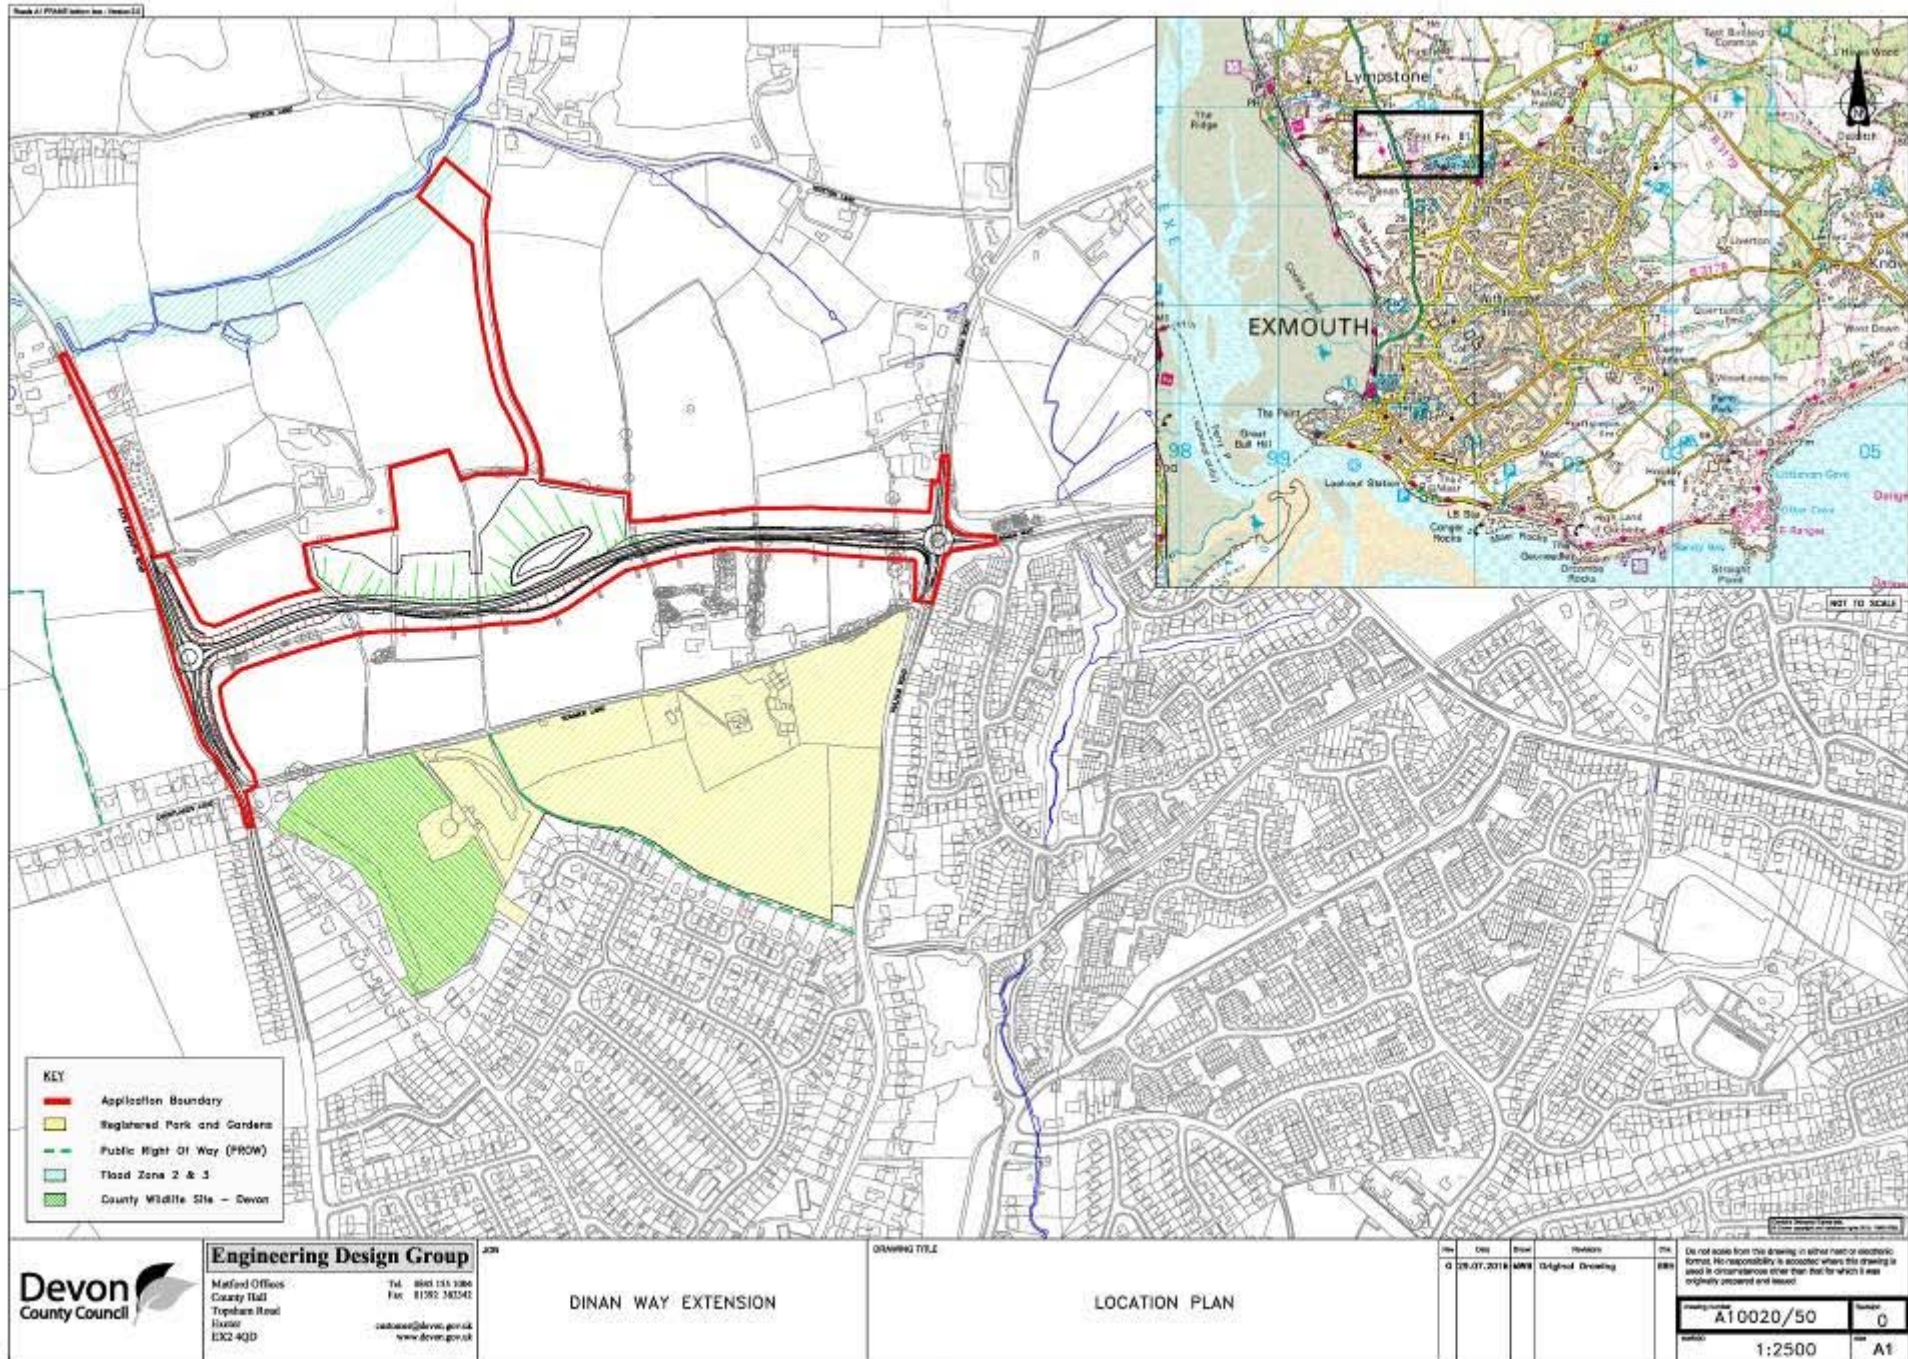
Location plan of Dinan Way Link Road and surrounding land use
